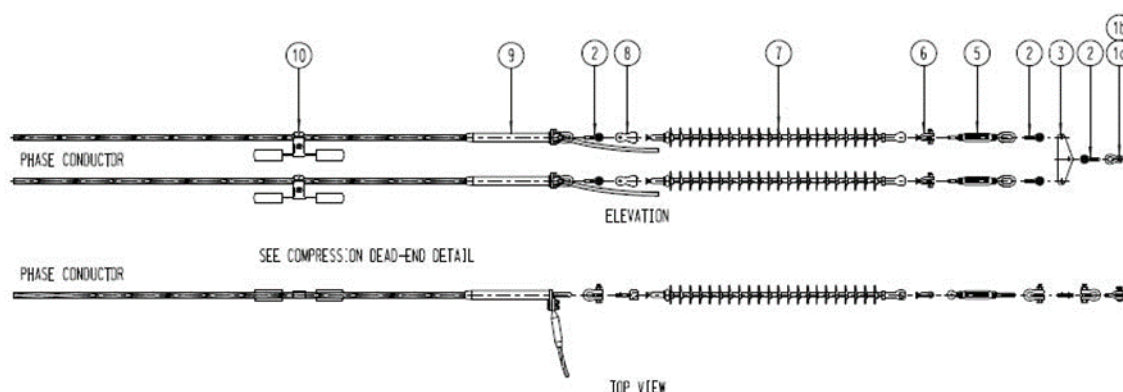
Option D: Phase Conductor Single Strain Assembly for Single “Conductor”
